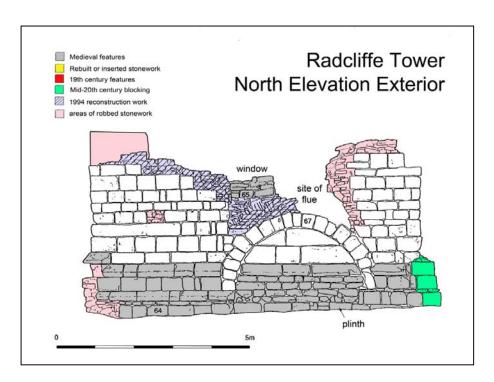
Radcliffe Tower northern elevation exterior 2014.
